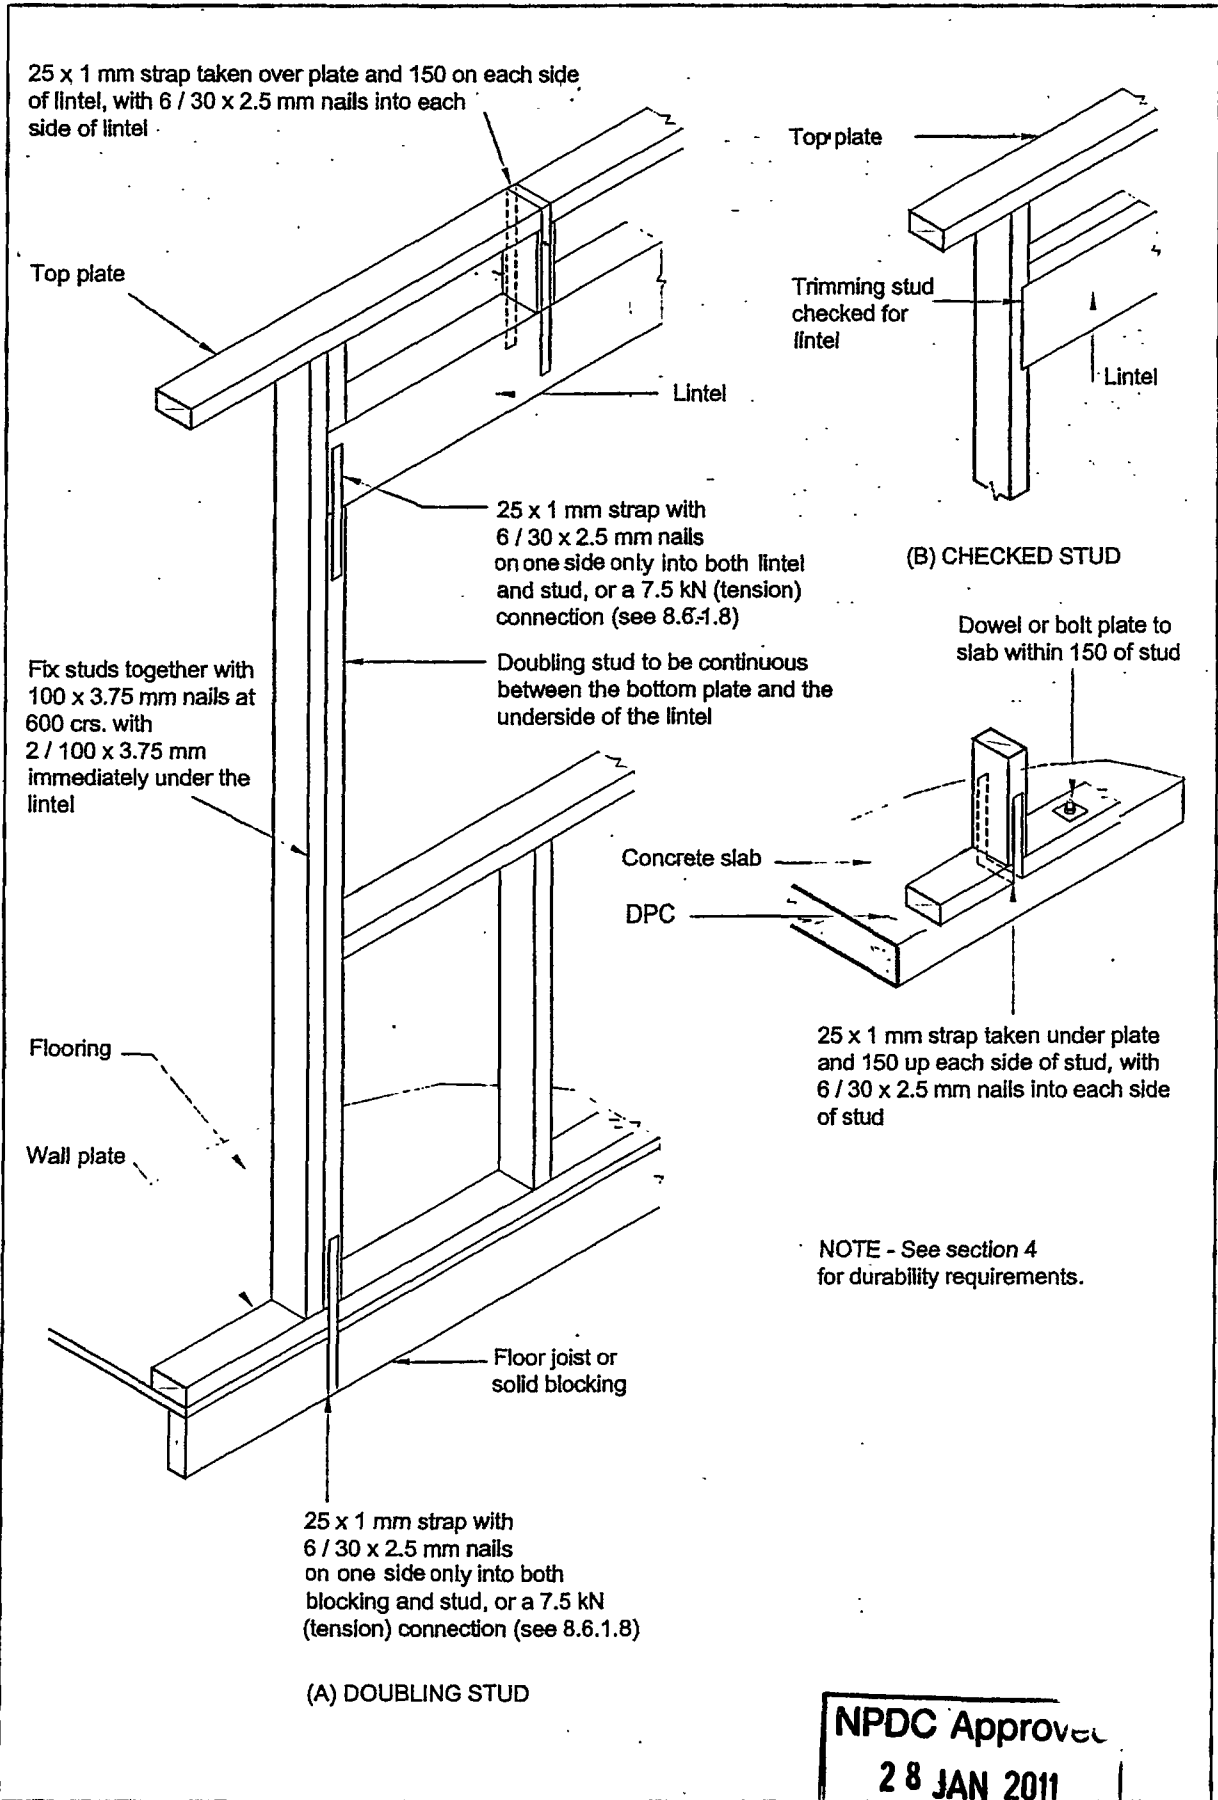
Fixing of lintels to prevent uplift (see 8.6.1.8 and tables 8.14(A) and (B))
